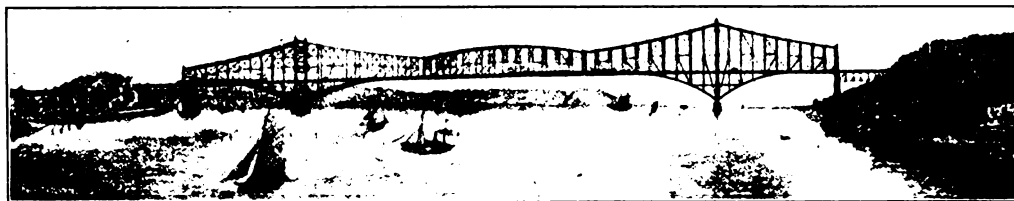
CANTILEVER BRIDGE OF 1,800-FT. SPAN AT QUEBEC, CANADA. E. A. Hoare, Chief Engineer; Phoenix Bridge Co., Phoenixville, Pa., Contractors for Superstructure.
